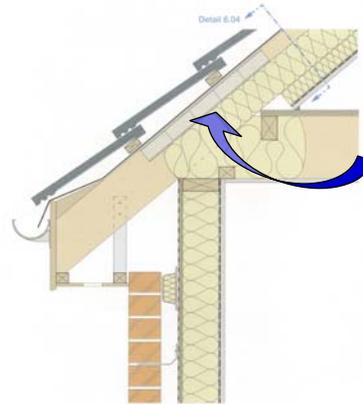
Robust Detail 6.03 – timber frame wall – roof junction.
